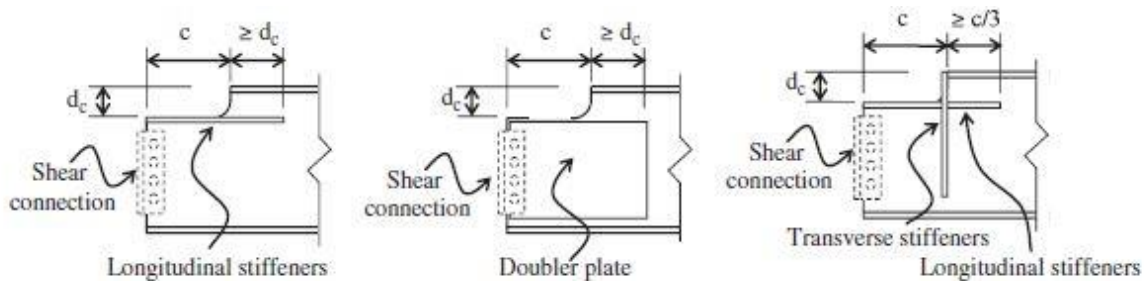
Reinforcement configurations tested by Cheng et al. (1984)
